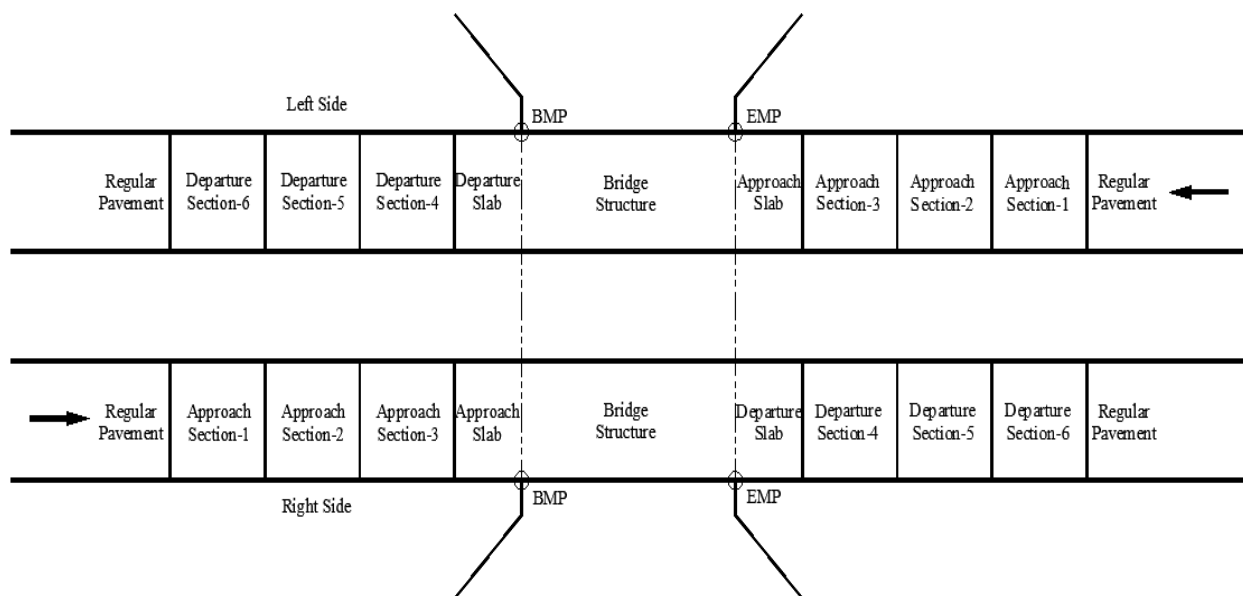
Schematic diagram of bridge approach/departure slab and pavement sections
